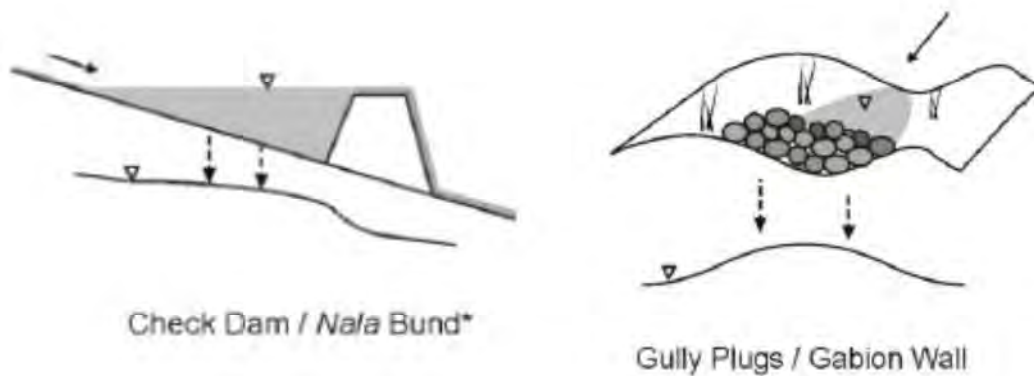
TYPICAL SECTION OF A CHECK DAM/GULLEY PLUGS
